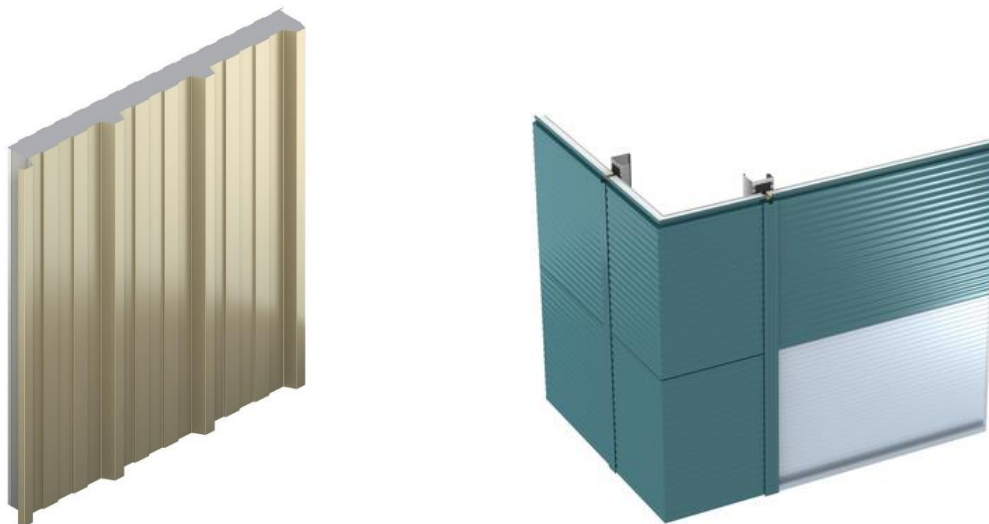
Examples of Kingspan 1000 insulated cladding (image credit www.kingspan.com)
